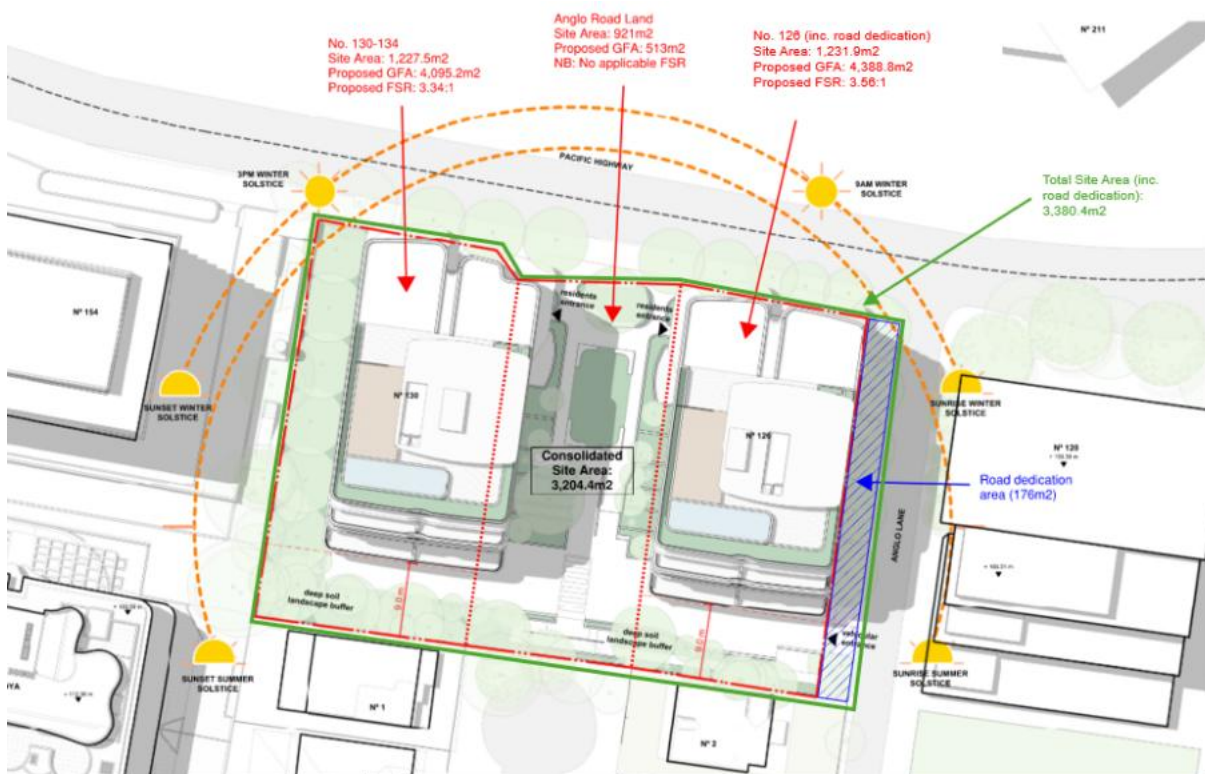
Proposed site plan – with site annotations added (*Source: Marchese Partners*)
